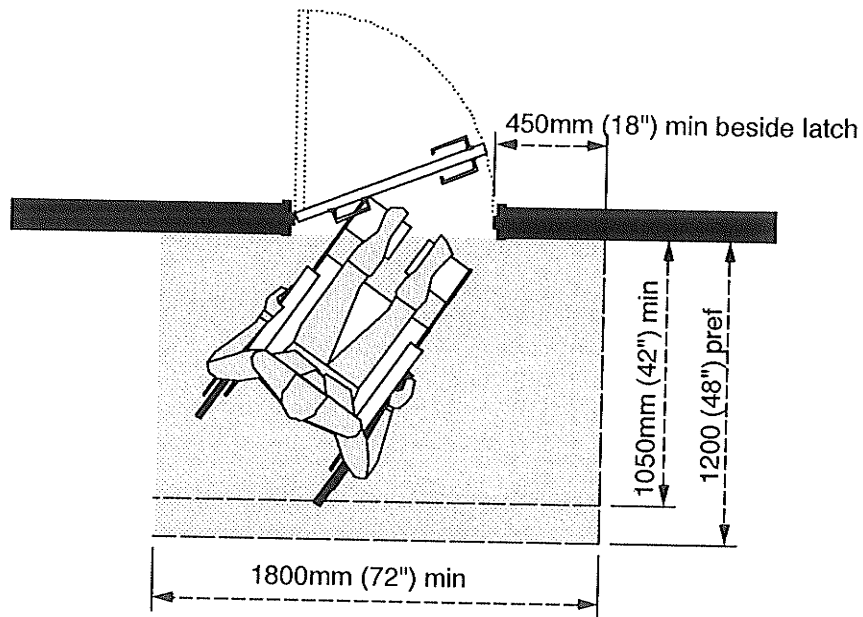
Minimum Doorway Maneuvering Space, Side-hinged Door, Hinge Side Approach, Push Side
